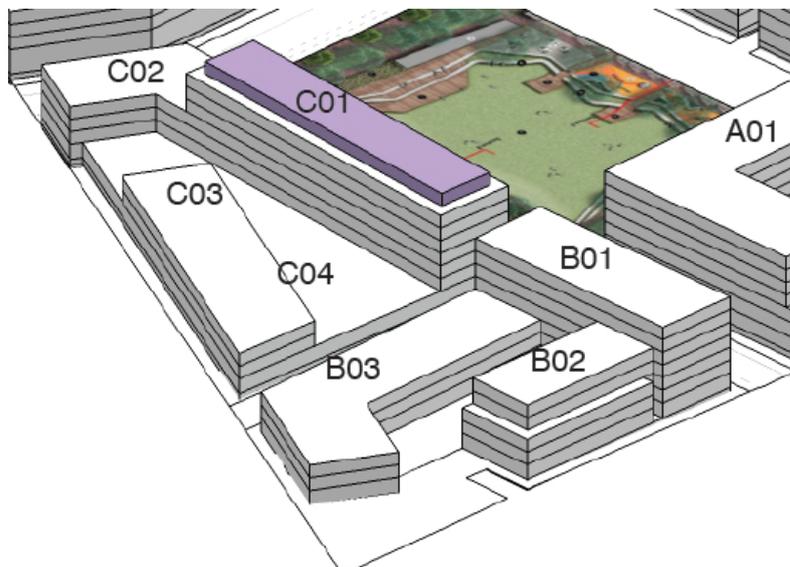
Axonometric drawing illustrating the existing Concept Approval building envelopes for Blocks B and C.
